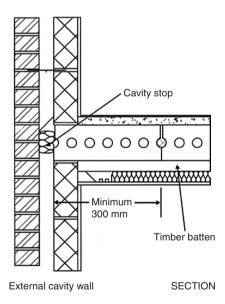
Floor type 2 – external cavity wall with masonry internal leaf
